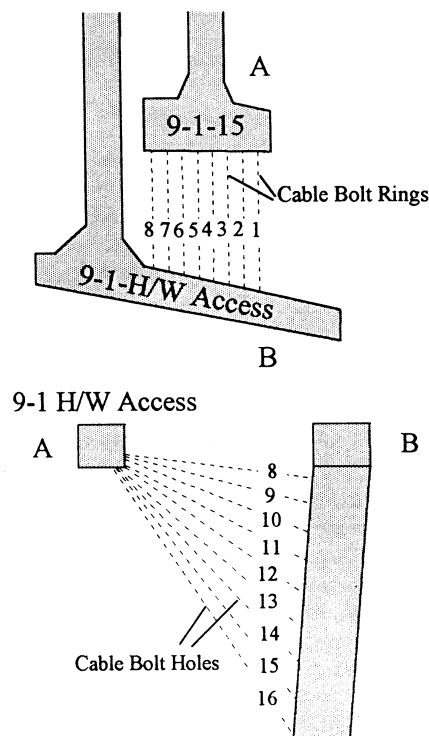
The cable bolt layout for the 9-1-15 stope in plan (Top) and section (Bottom).
